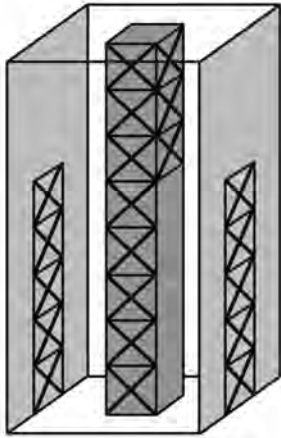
Illustration of lateral system with bracing elements repositioned over height of the structure.
